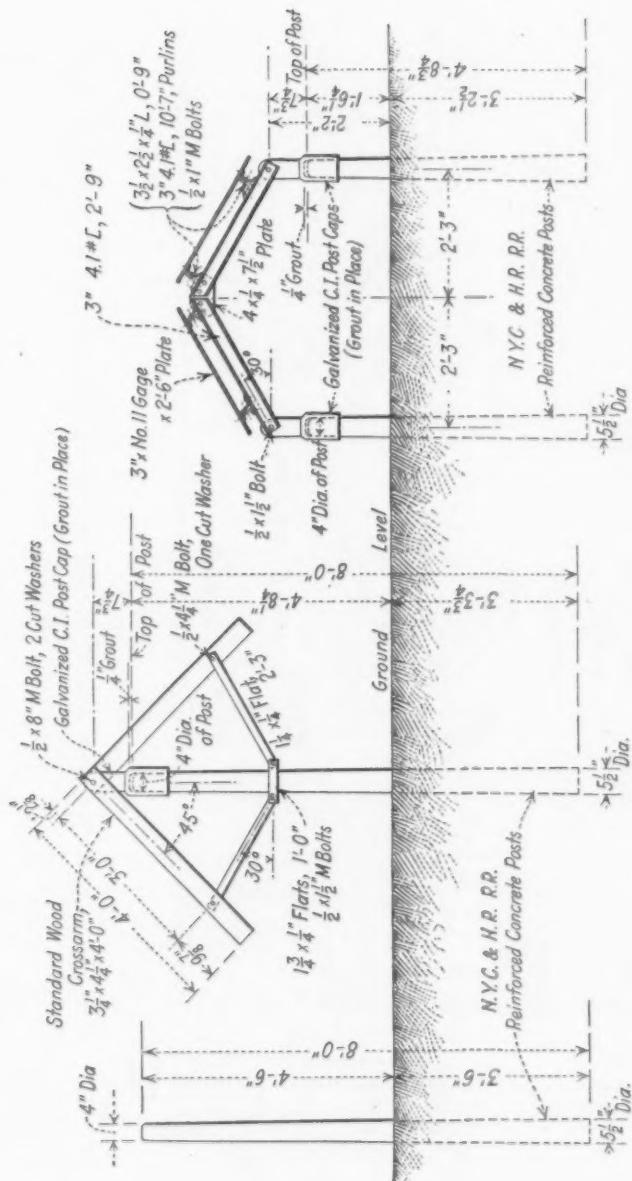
Cross-Section of the Sheet, Wire and Fencing Racks at State College.
